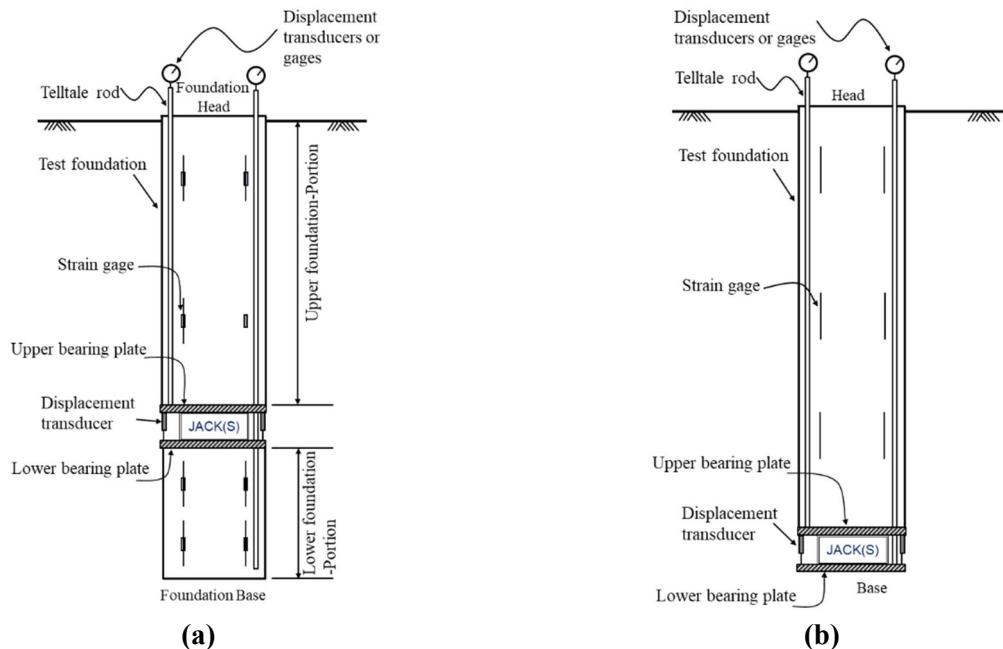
Conventional Bi-Directional Load Test arrangement a) Jack(s) at the geotechnical equilibrium point and b) Jack(s) at the foundation base
